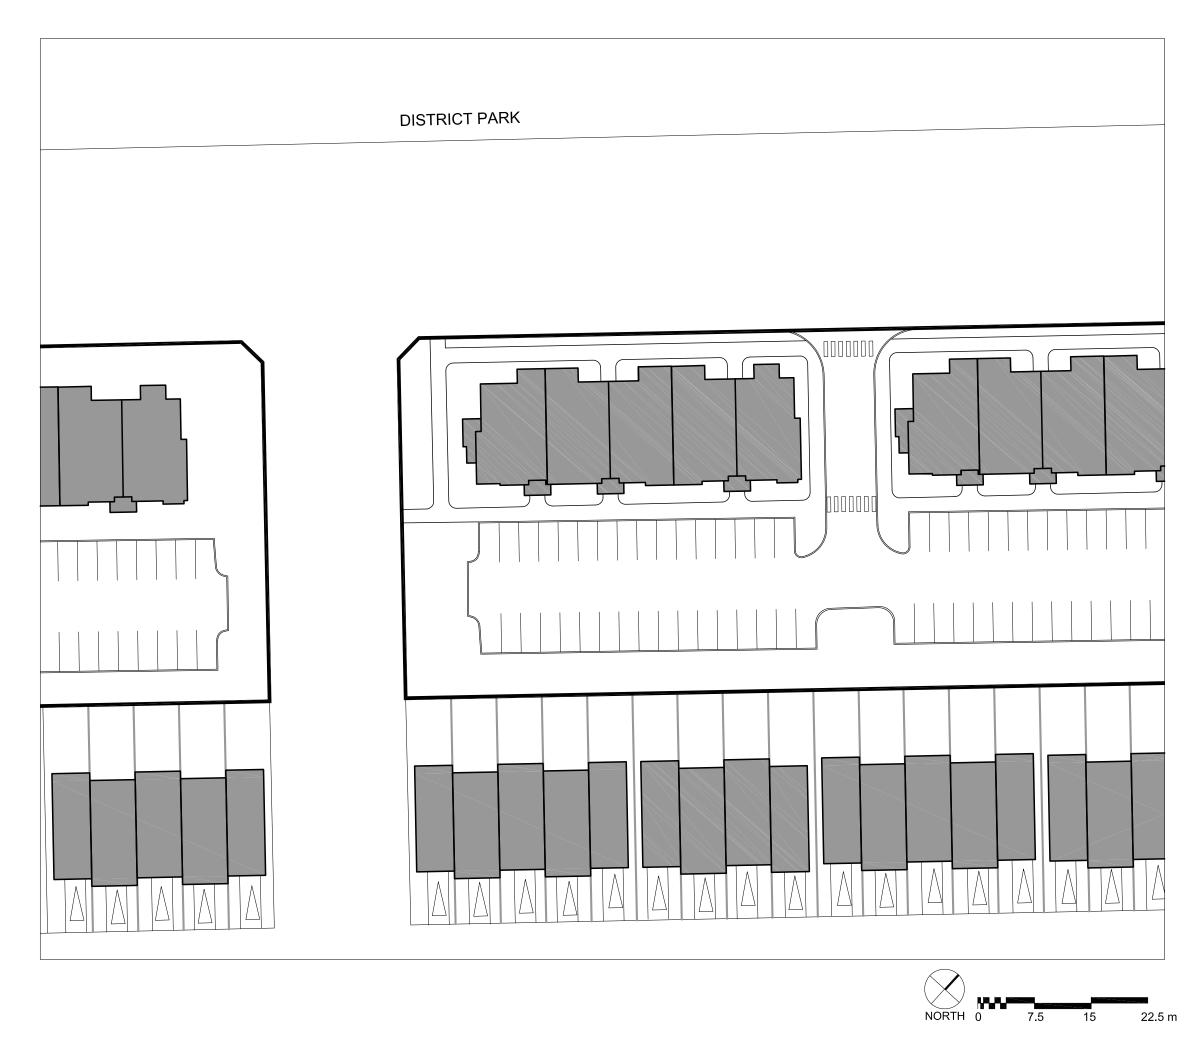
Figure B - DETACHED DWELLINGS AND TOWNHOUSE DWELLINGS
